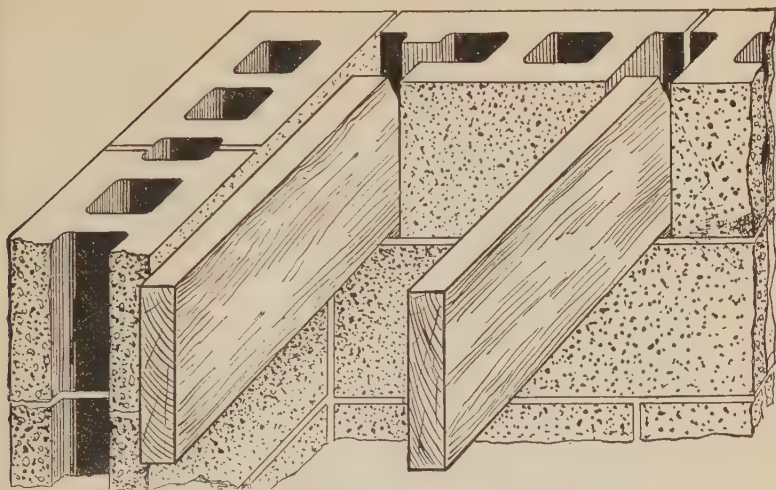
,262.—Joist block as used in hollow block wall construction. }
